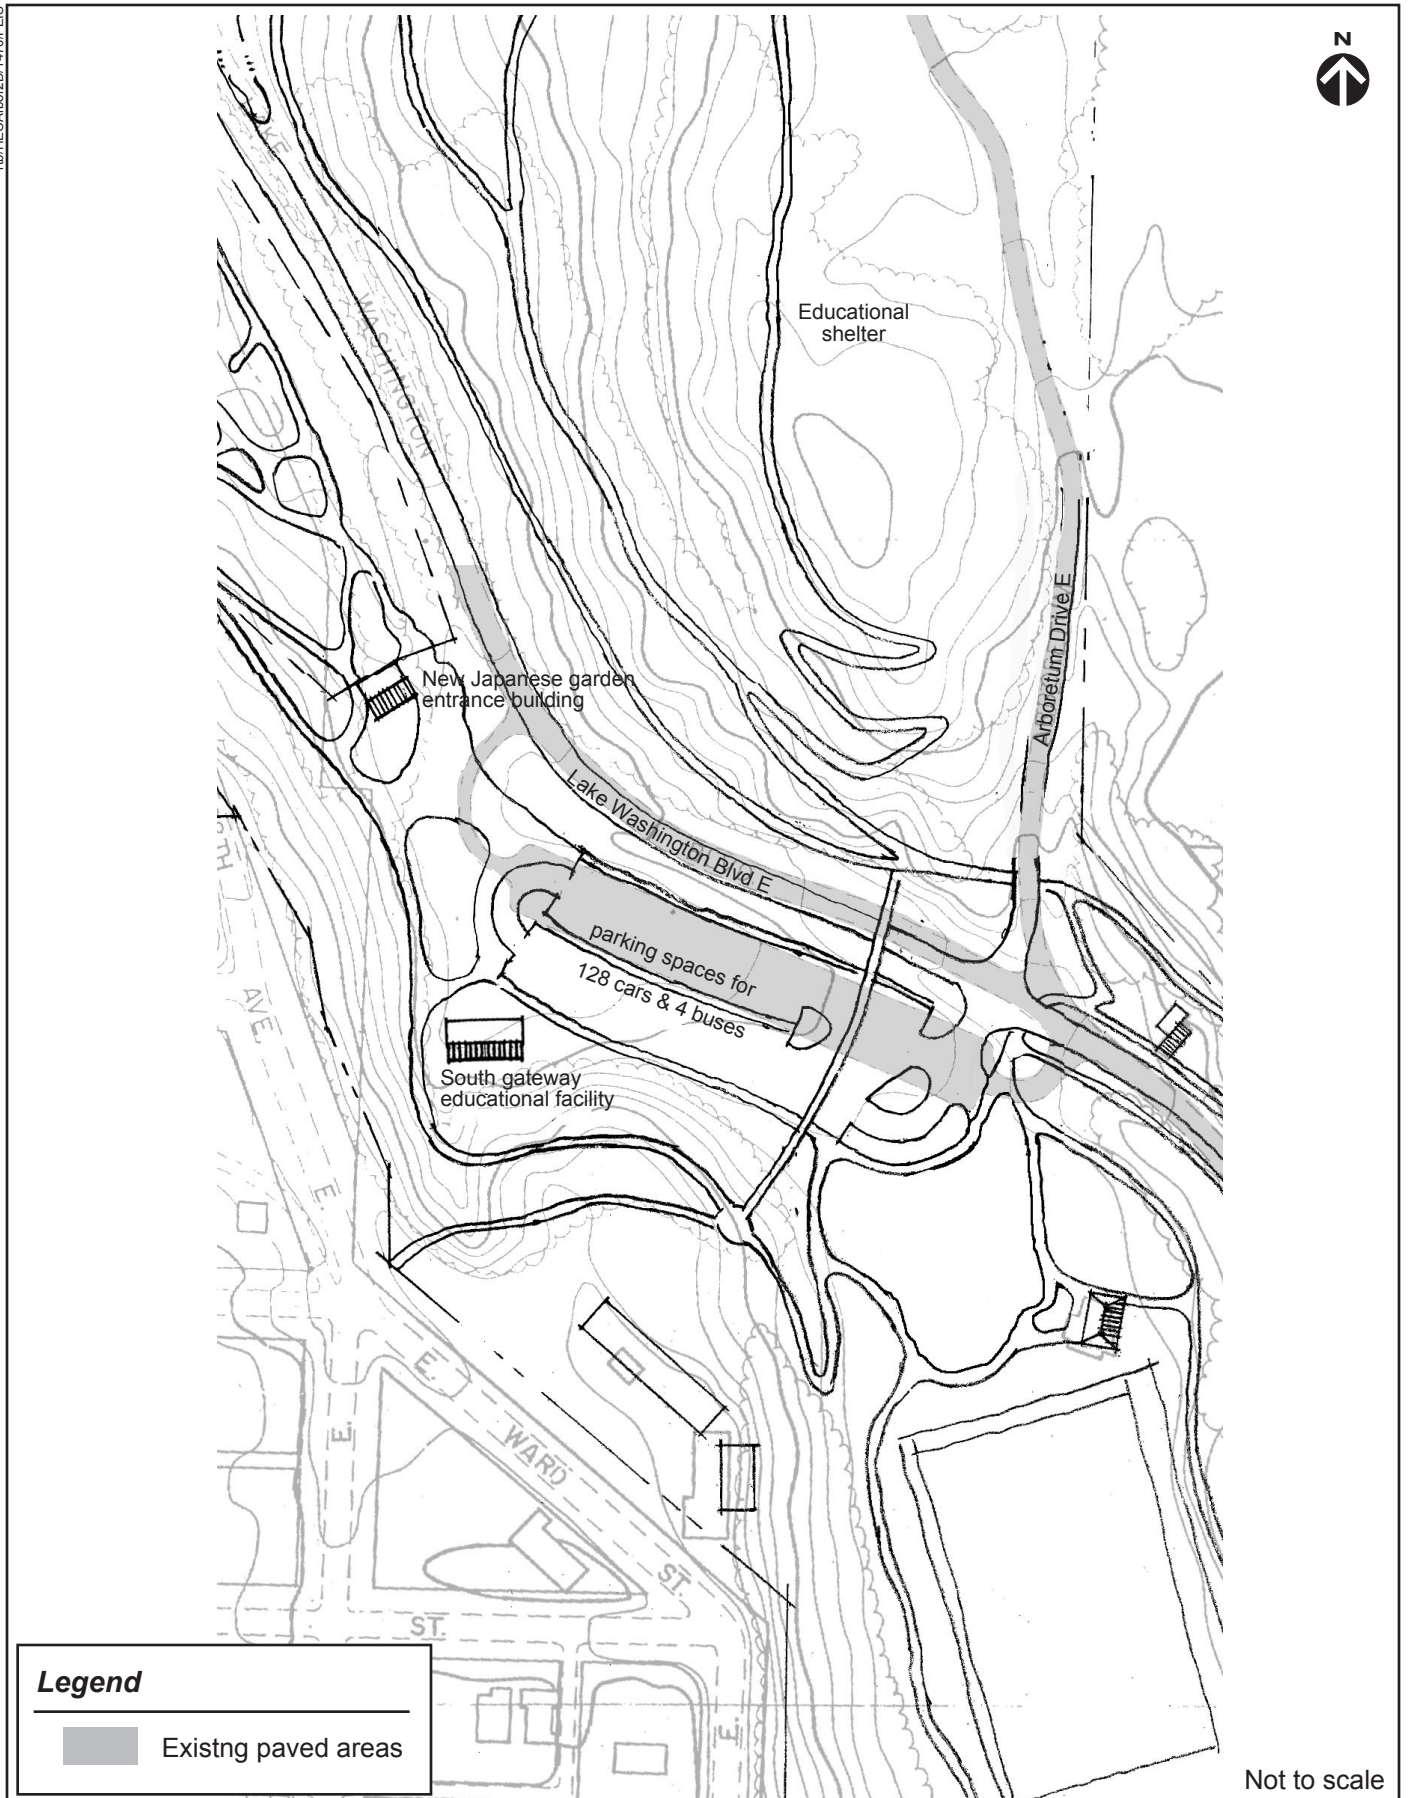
Proposed plan for south-end gateway educational facility, reconfigured parking lot, and Japanese garden entrance.
